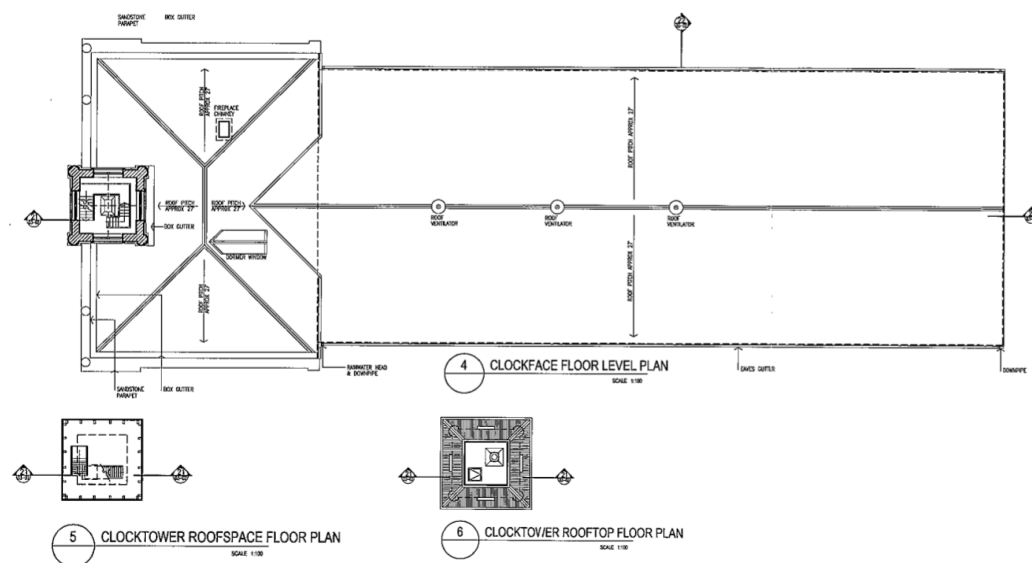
Floor Plans of Town Hall - North Up Page (Source: SDRC supplied)
